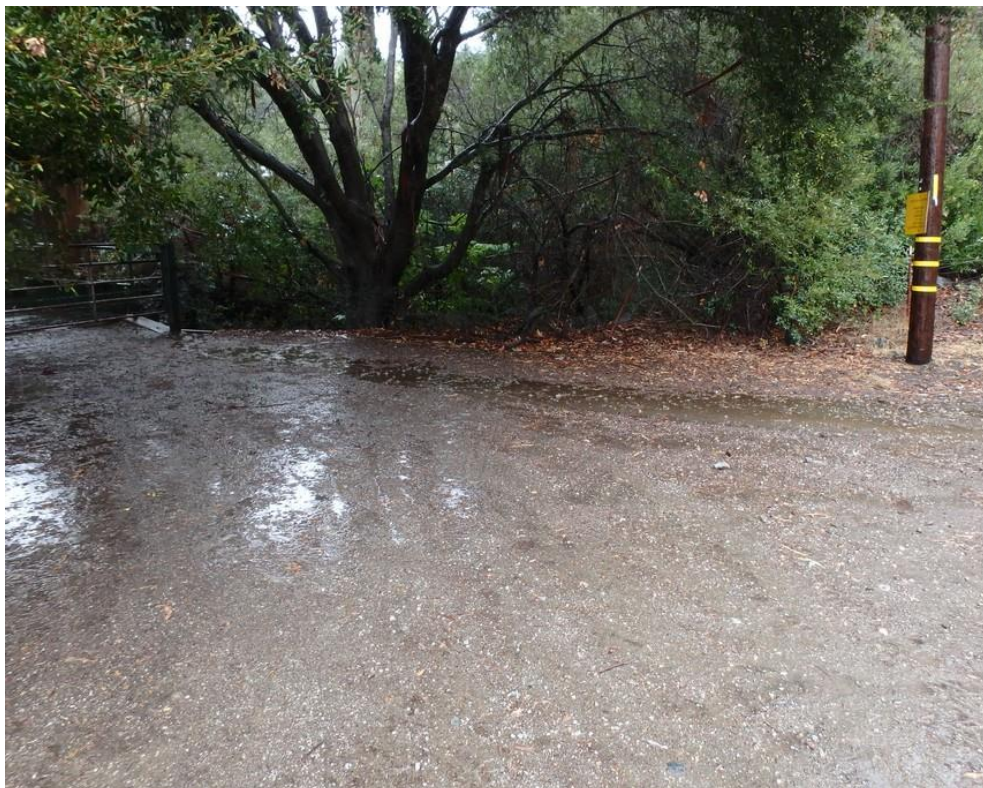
Site 234: View of Site 234 ditch relief culvert inlet area (see arrow).
